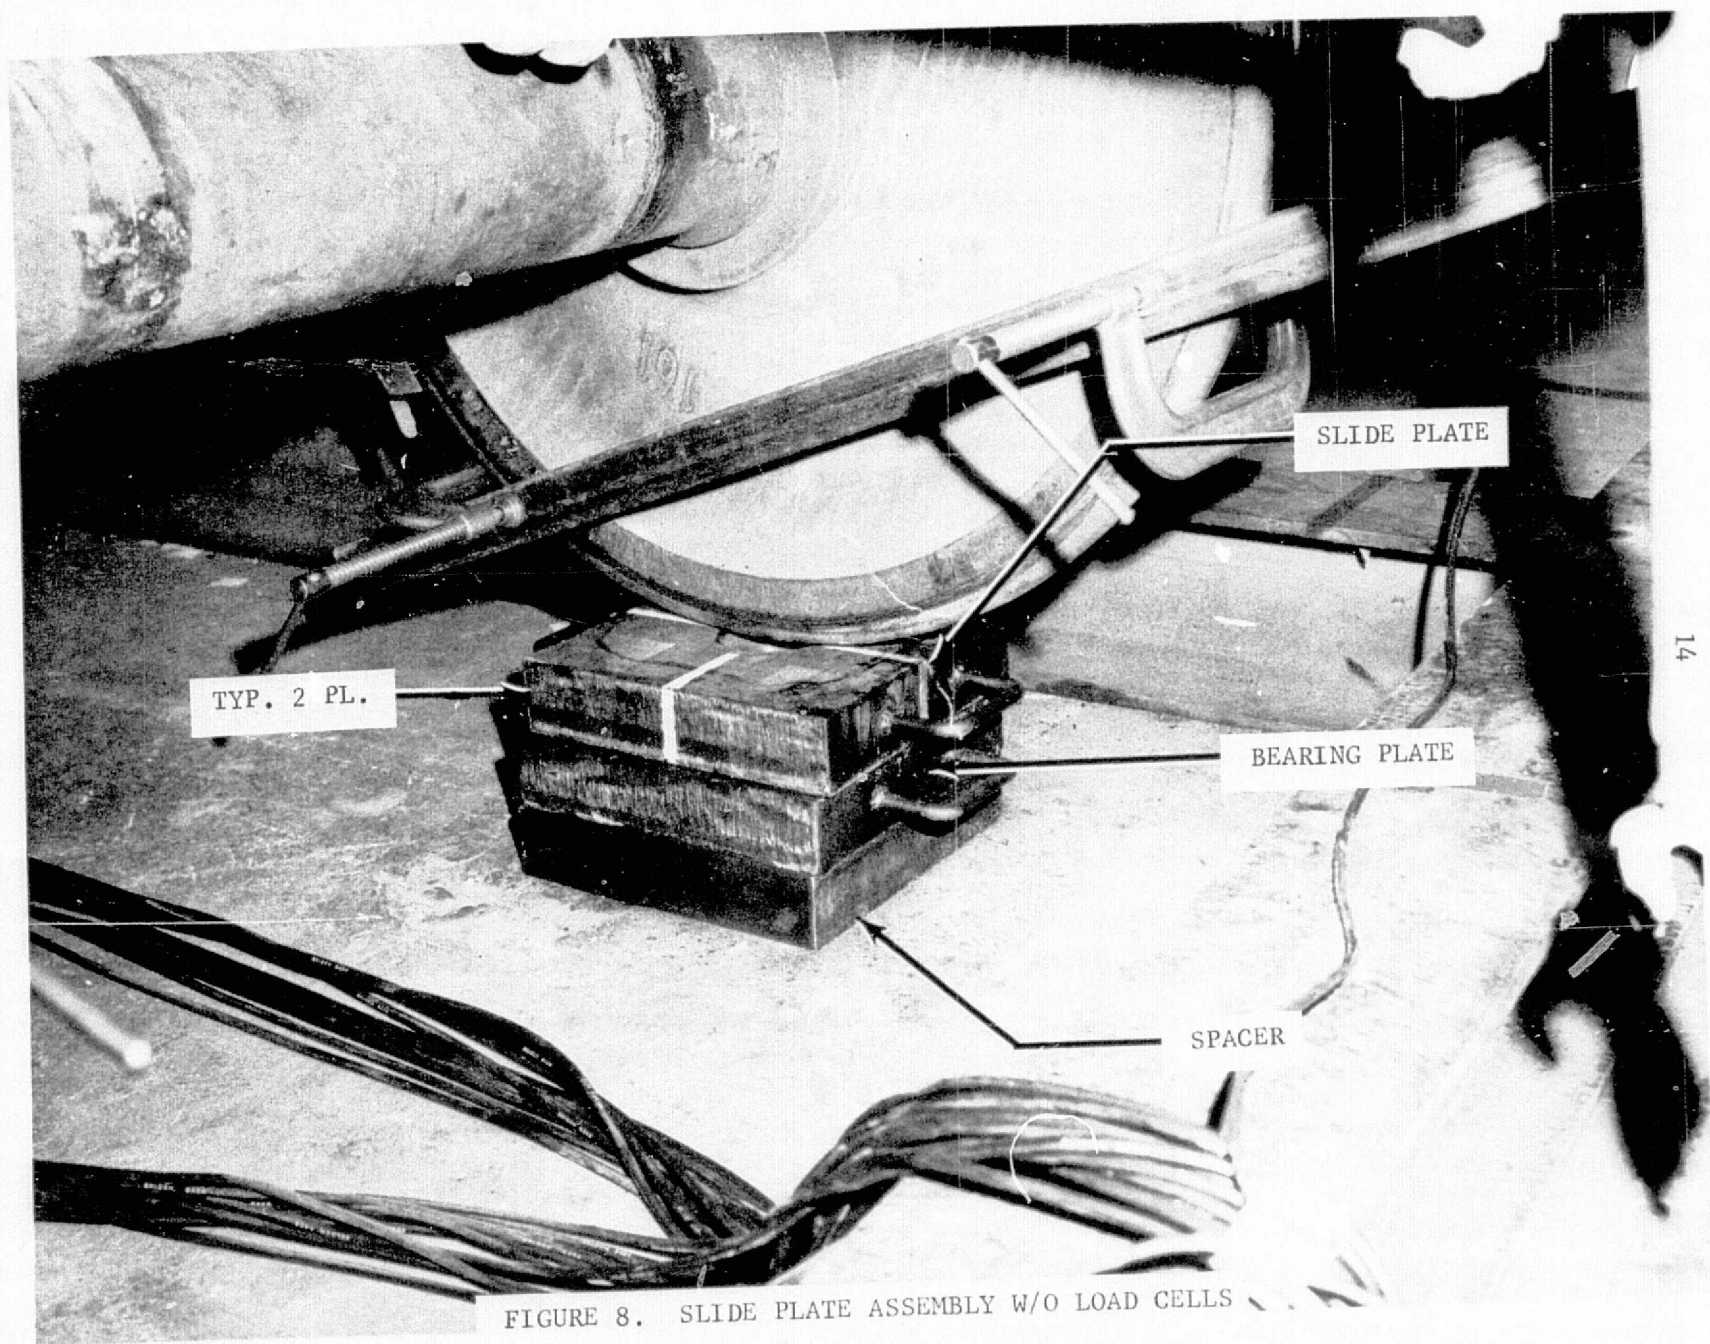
SLIDE PLATE ASSEMBLY W/O LOAD CELLS
